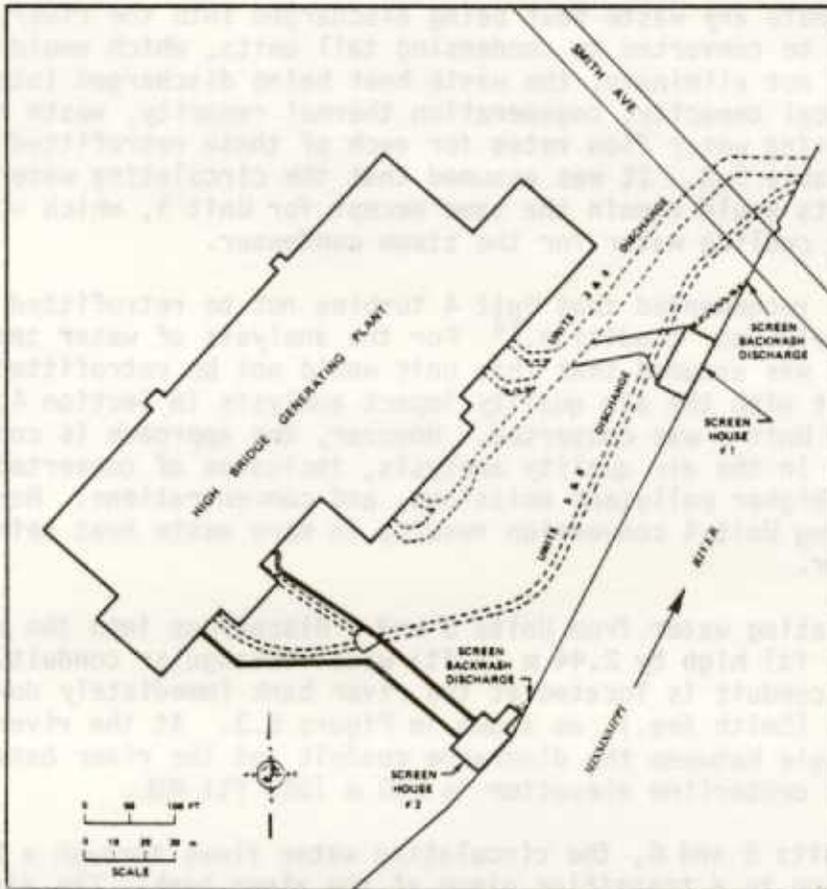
Schematic of High Bridge Generating Plant showing location of intake structures, plant, and discharges.⁶⁰
